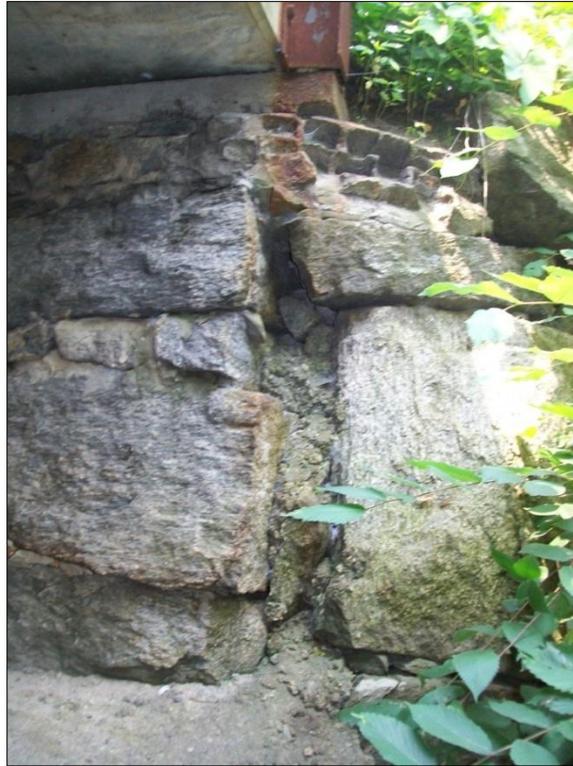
Looking South: Large Void Where West Abutment Meets Northwest Wingwall
